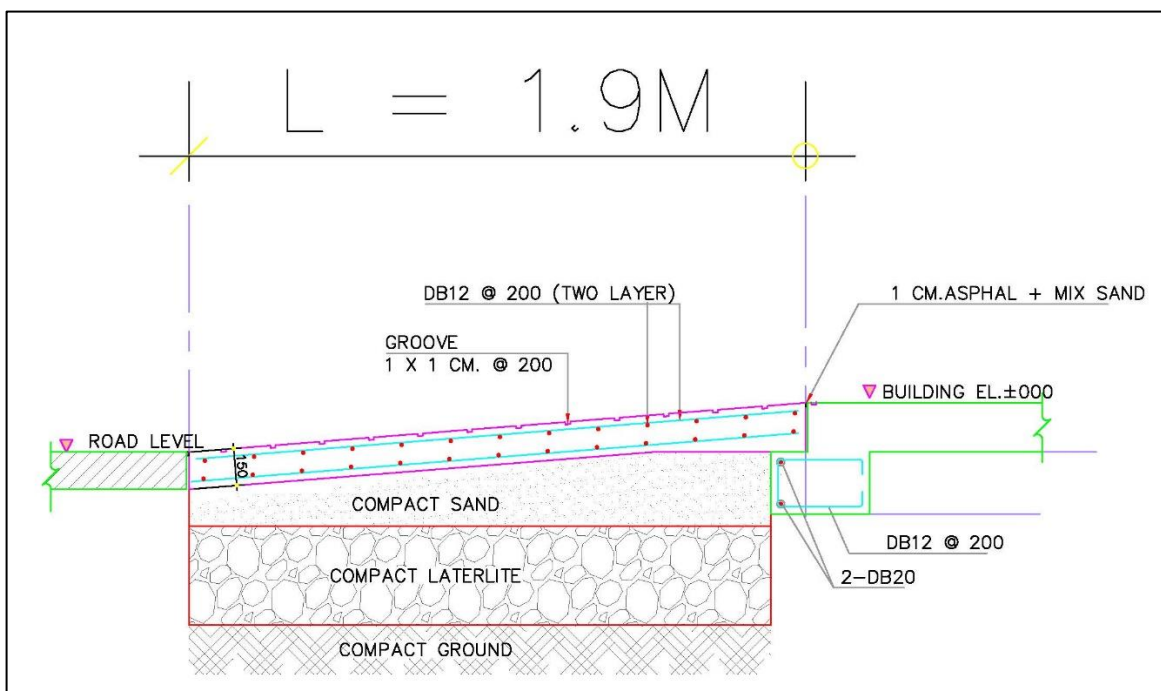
Detail of Ramp (Slope) for Drainage System
